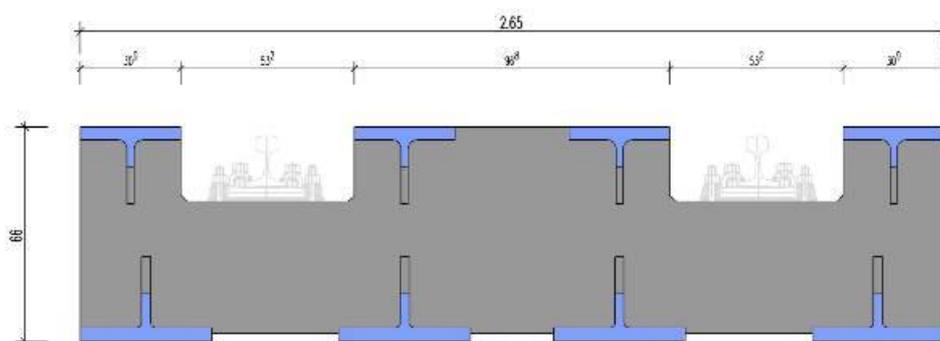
VFT-Rail cross-section with 66cm construction height and external reinforcement
